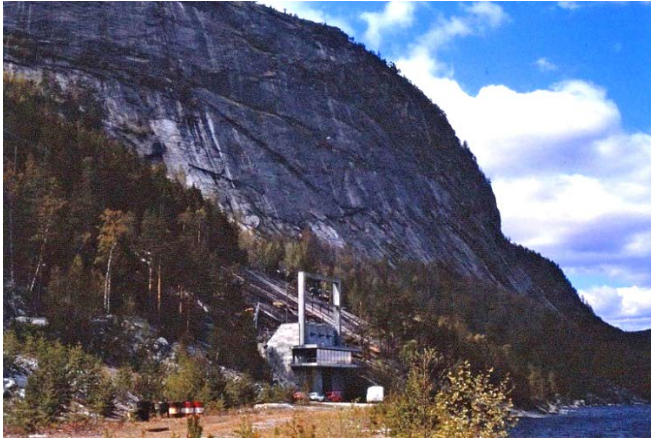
Entrance to the Fjone underground power station located at the foot of a large granite mountain. Severe rock bursting was experienced in the access tunnel and underground powerhouse during excavation.
